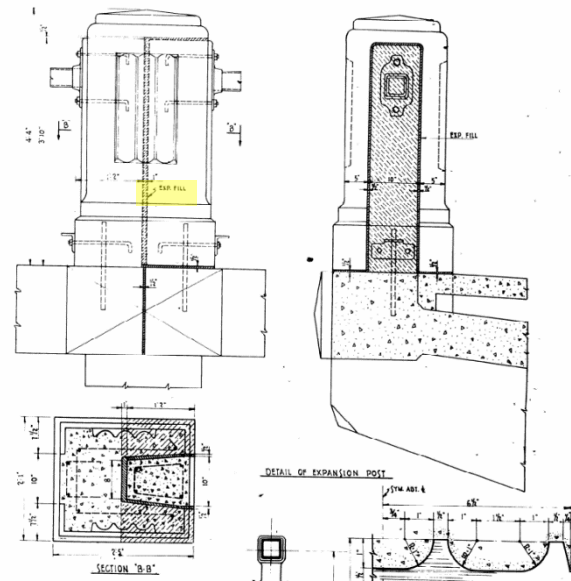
Detail from 1916 blue line plans with expansion joint shown in railing post (highlighted).
